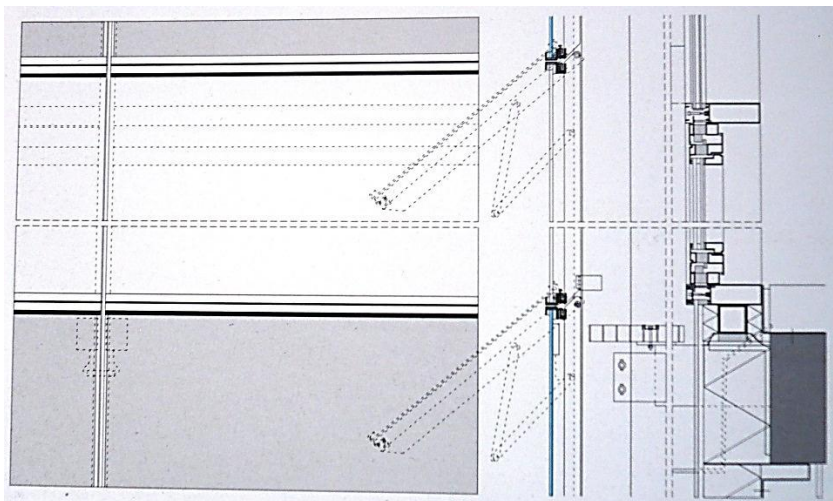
Wall section and detail of the Würth Solar CIS Factory in Schwabisch Hall, Germany (Lüling, 2009).
